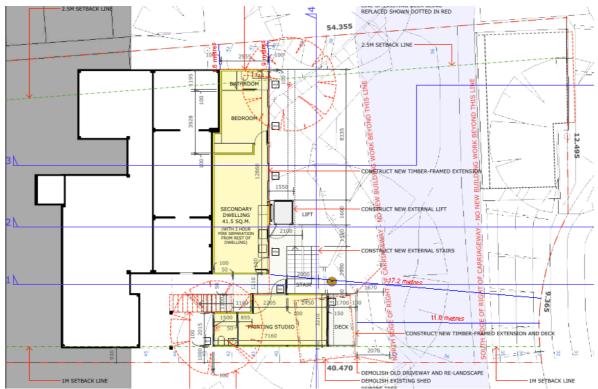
Proposed Level 1 Floor Plan (Secondary Dwelling)
